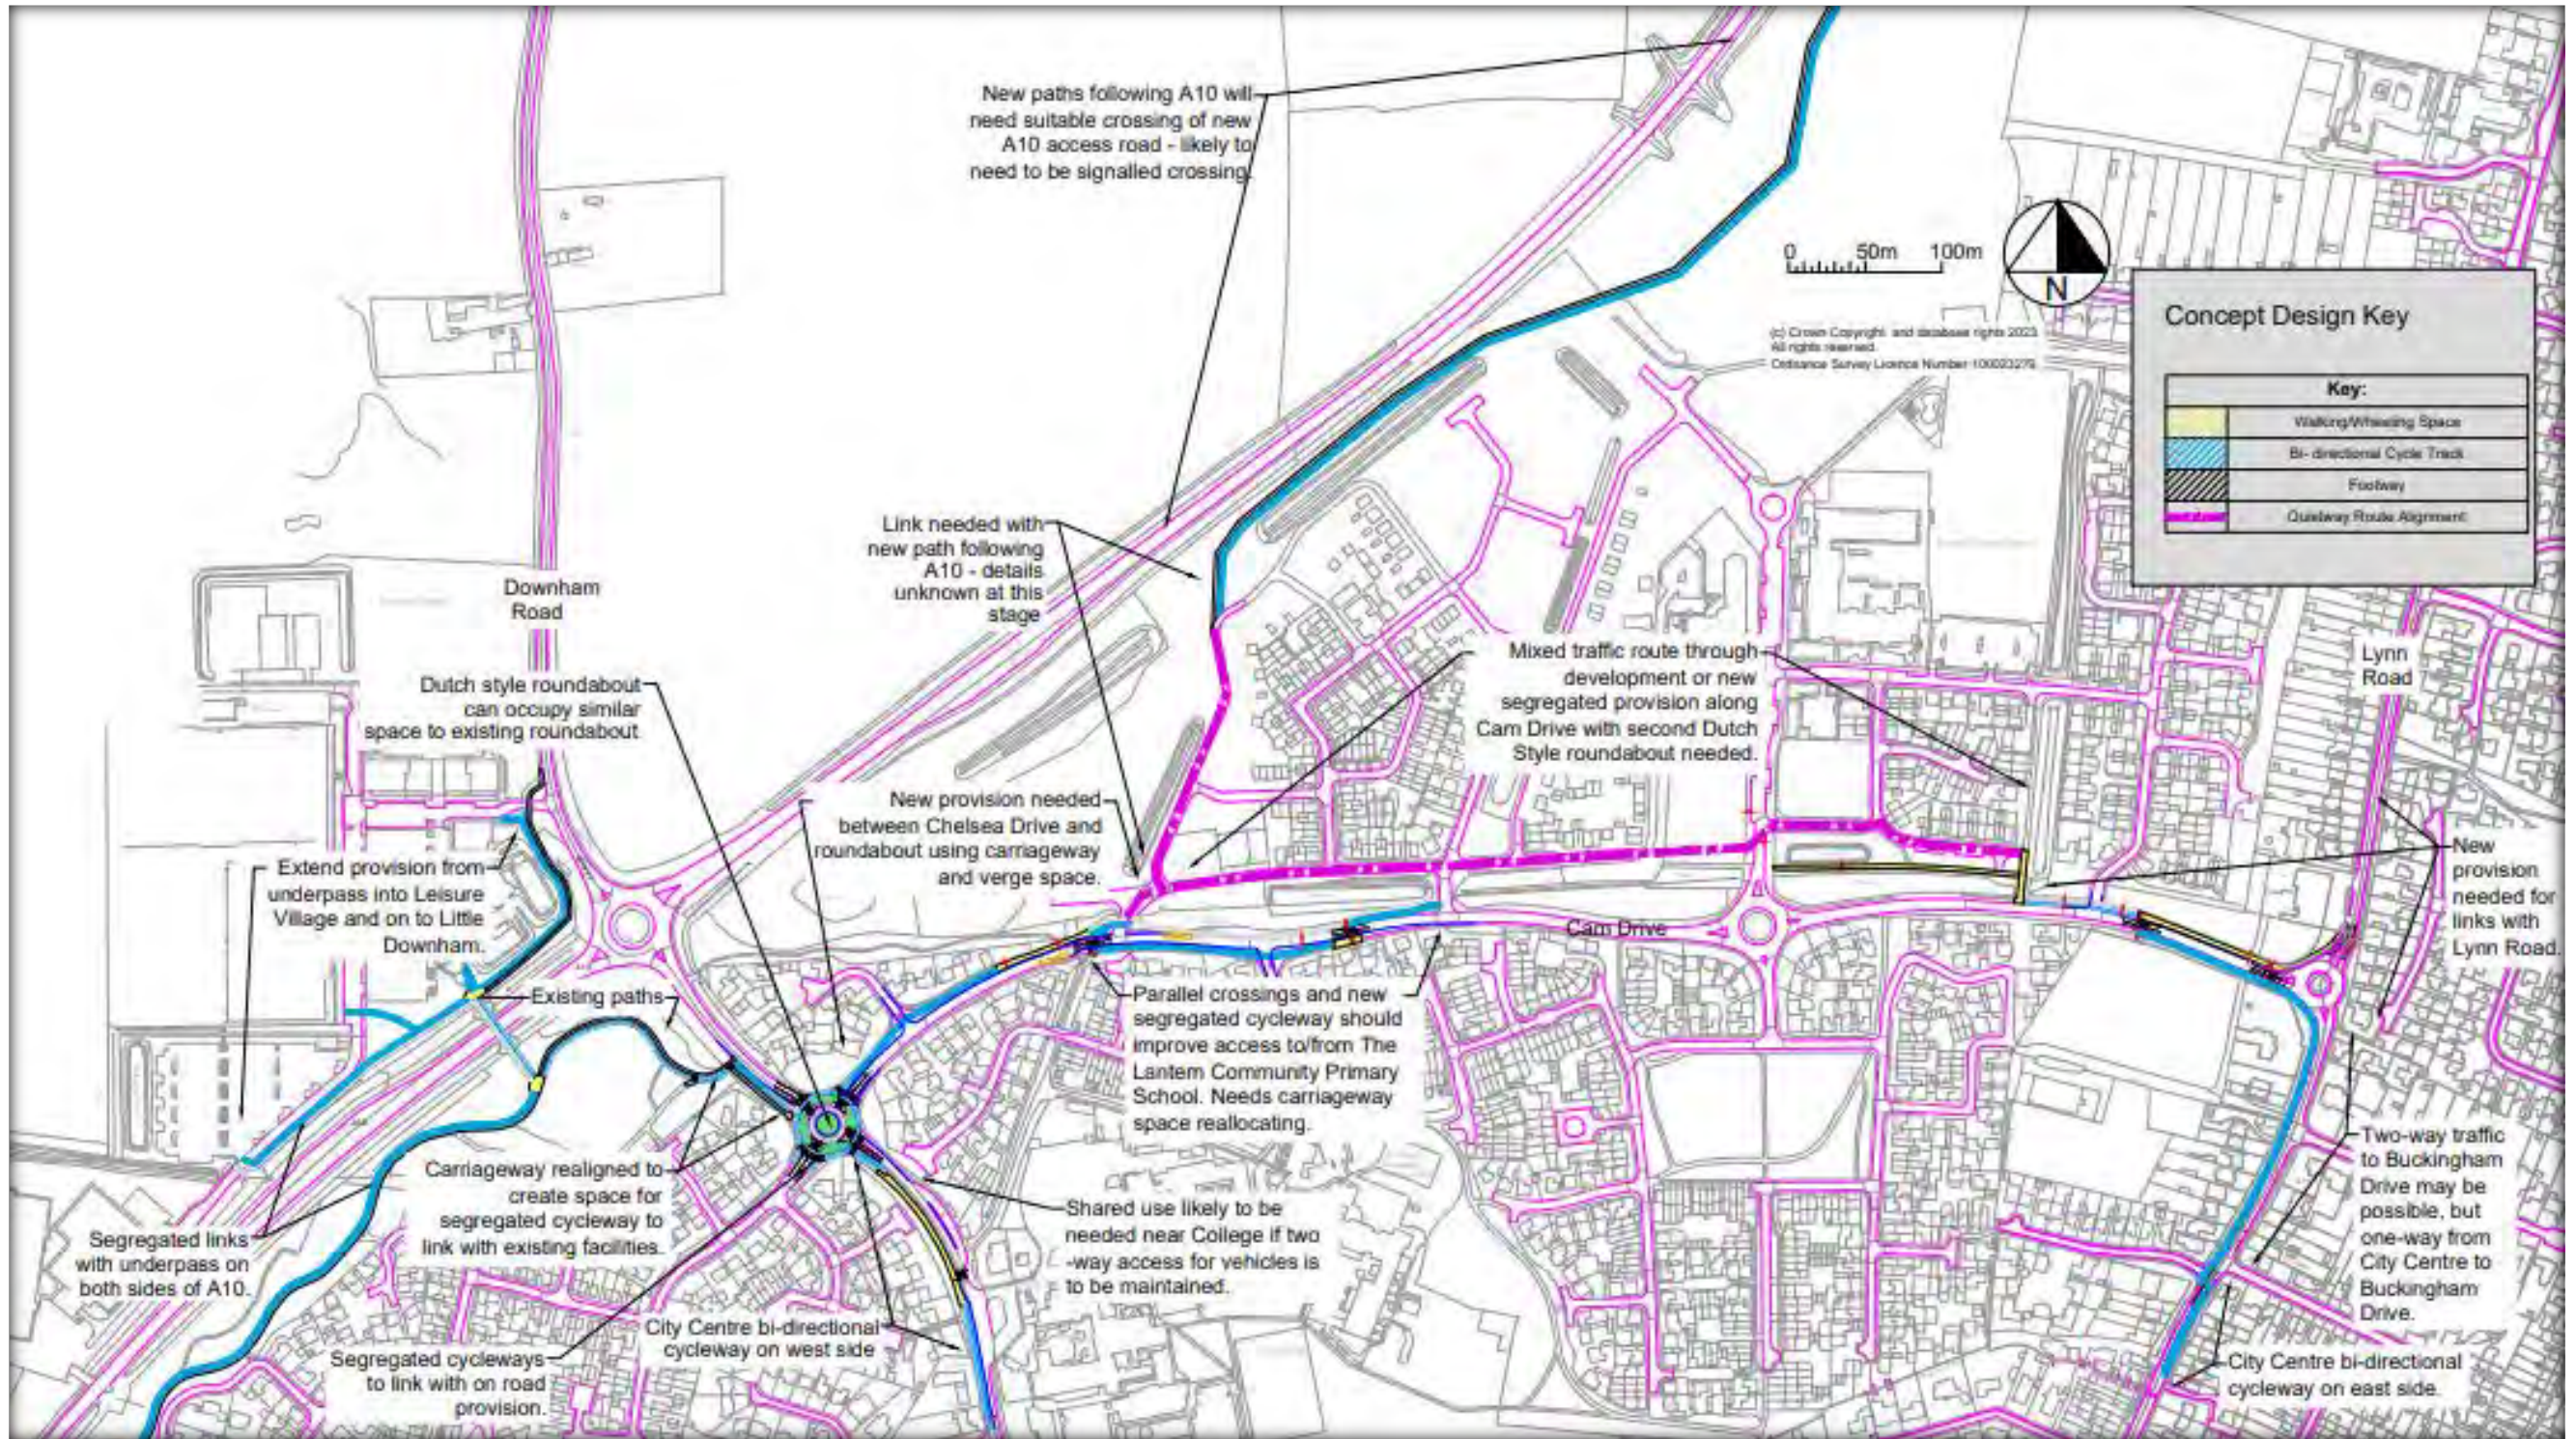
Preliminary drawing showing re-allocation of road space to form new cycleways, footways and shared use paths. Note that Community Engagement and detailed design are needed.
